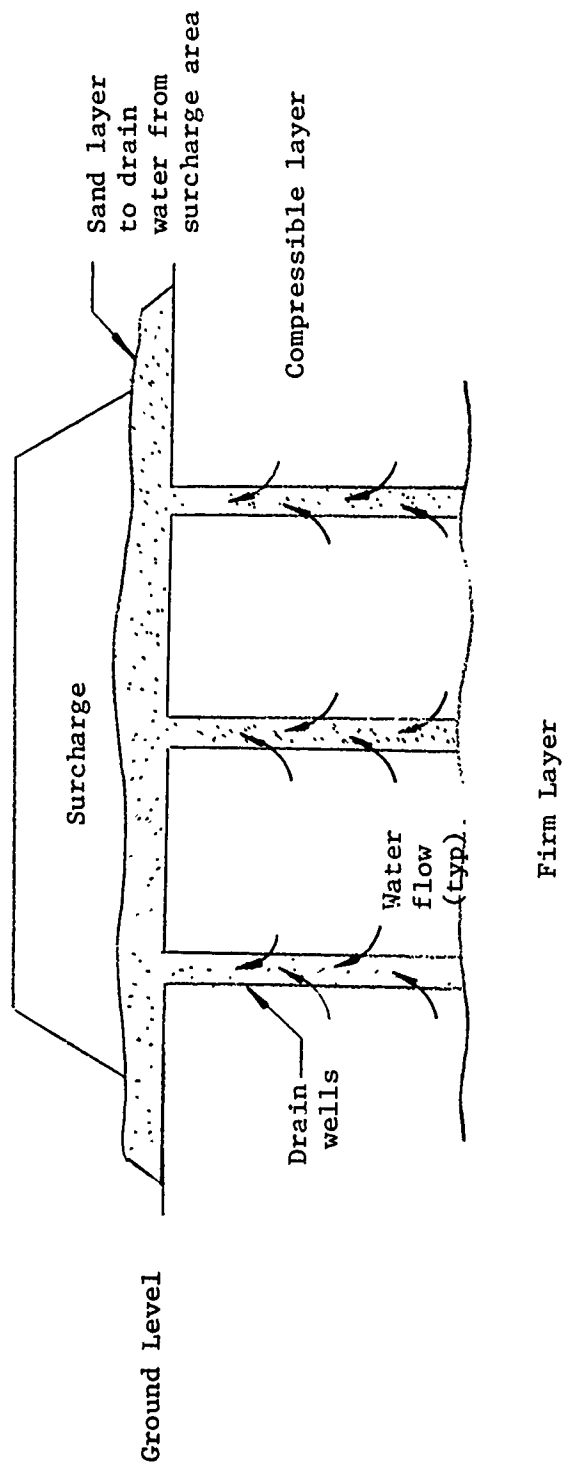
Concept for Surcharging Soil Using Sand Drain Installation
